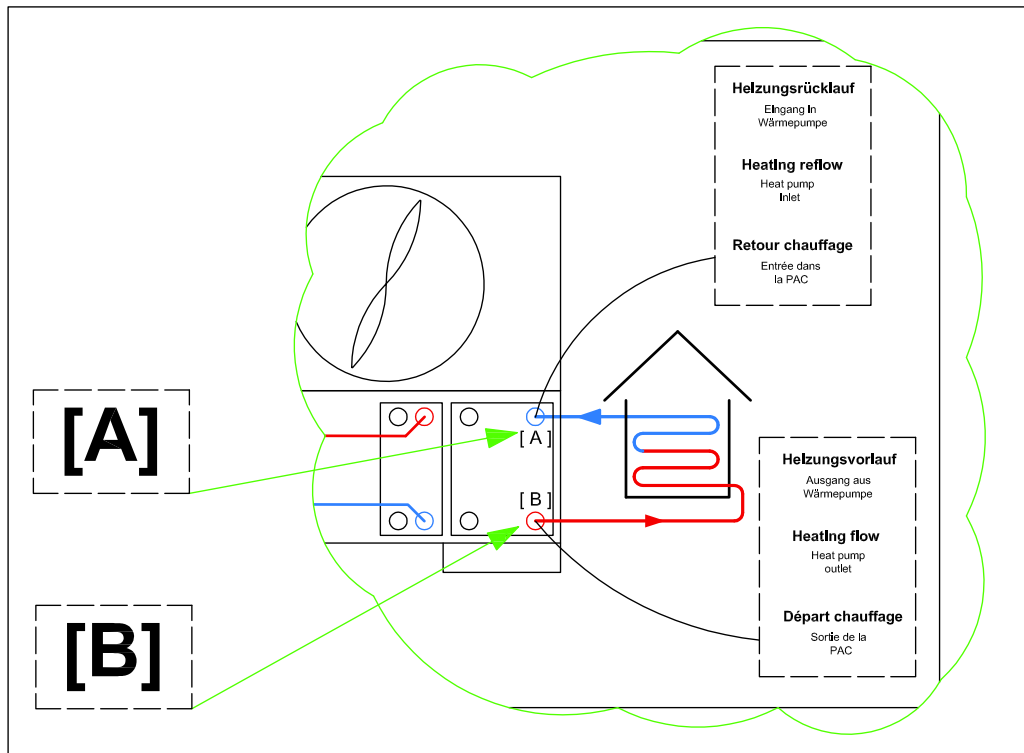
Schematic view / heat pump connections (label affixed inside the heat pump)
